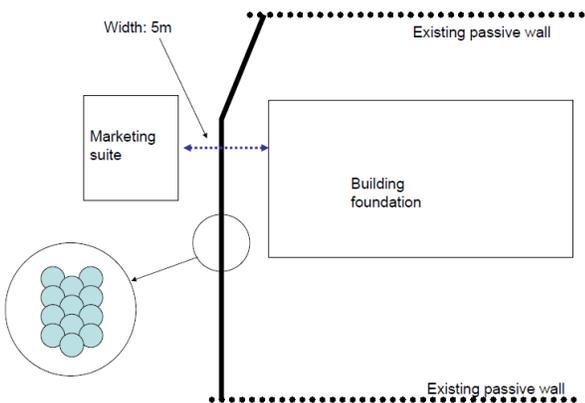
Barrier Installation Utilising a Continuous Flight Auger (Soil Mixing)
